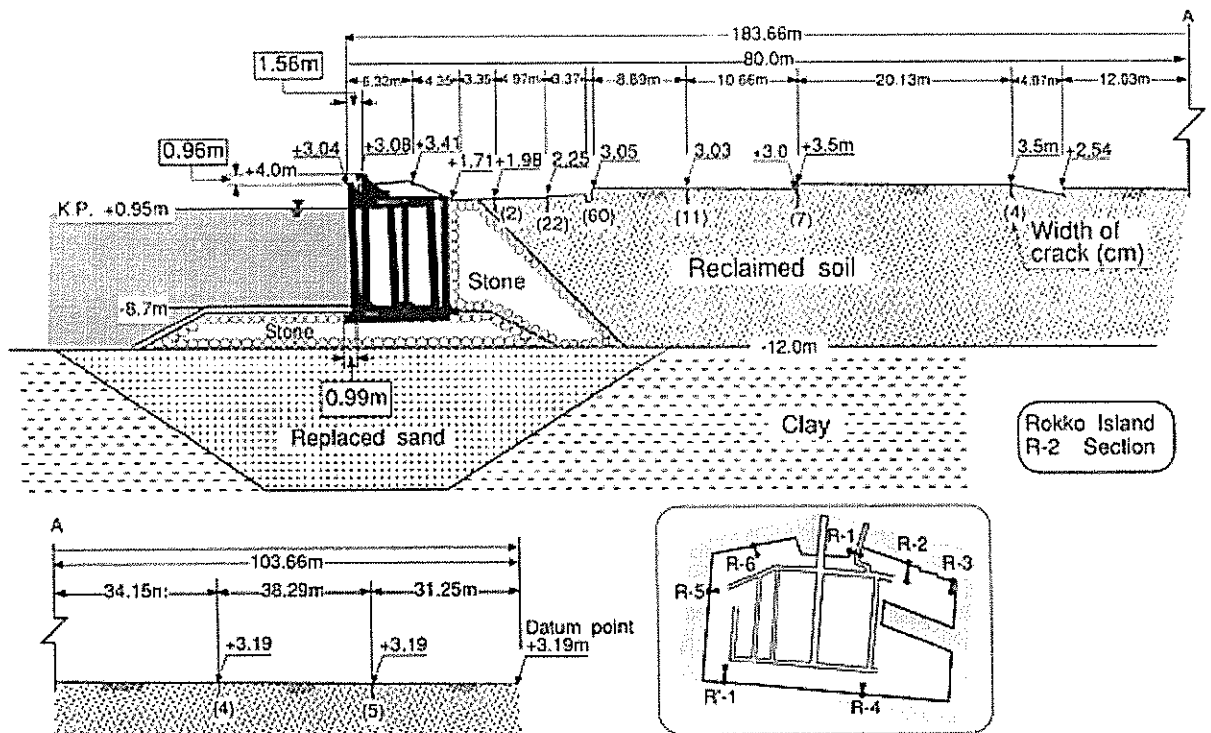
Detailed Profile of the Ground Deformation at R-2 Section in Rokko Island.
